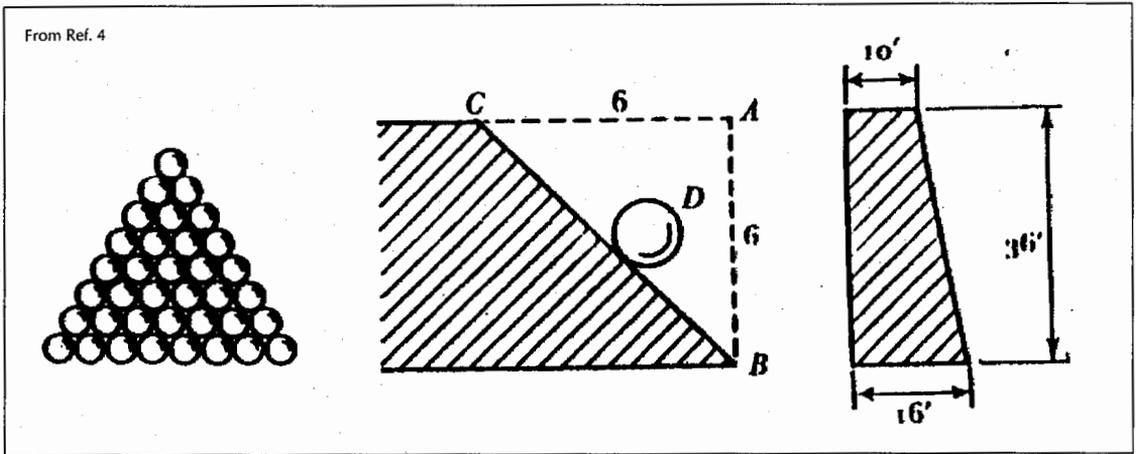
Bullet's representation of soil structure and his design parameters for a retaining wall.
